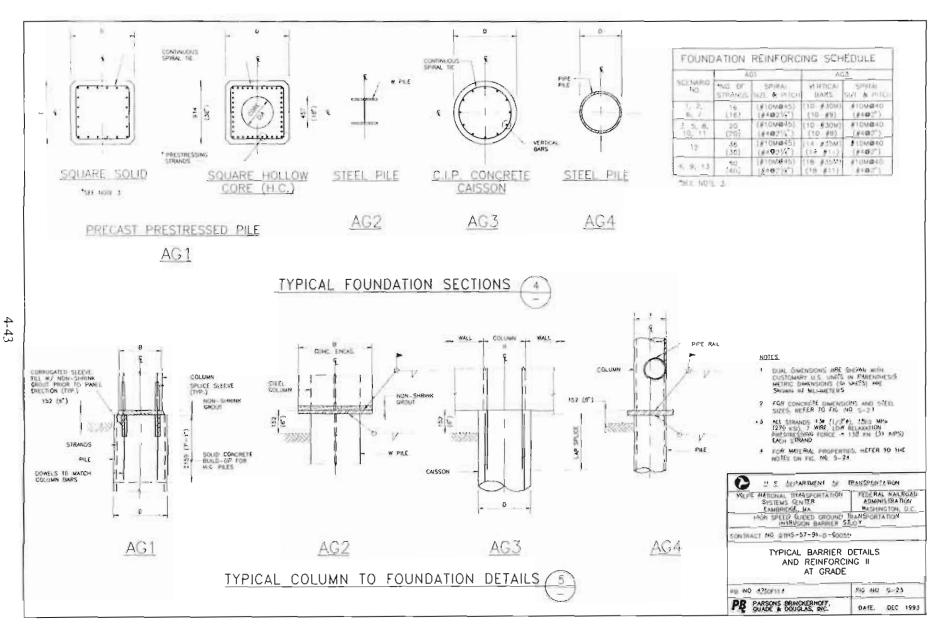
TYPICAL BARRIER DETAILS AND REINFORCING AT GRADE (II)
